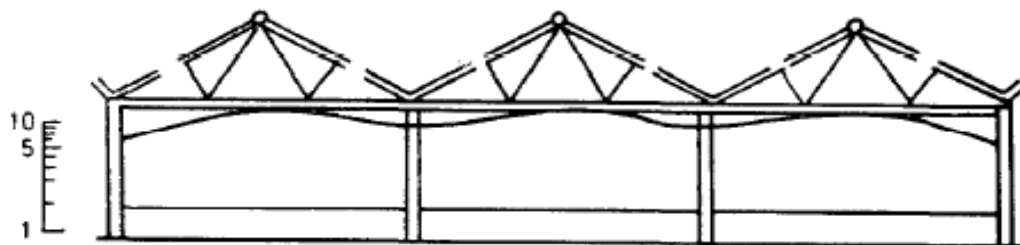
SHED TYPE ROOF WITH CONTINUOUS STRIPS OF GLAZING
